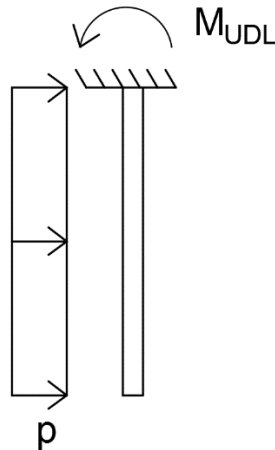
Section forces of a cantilevering beam with uniform load, e.g. surcharge load.
